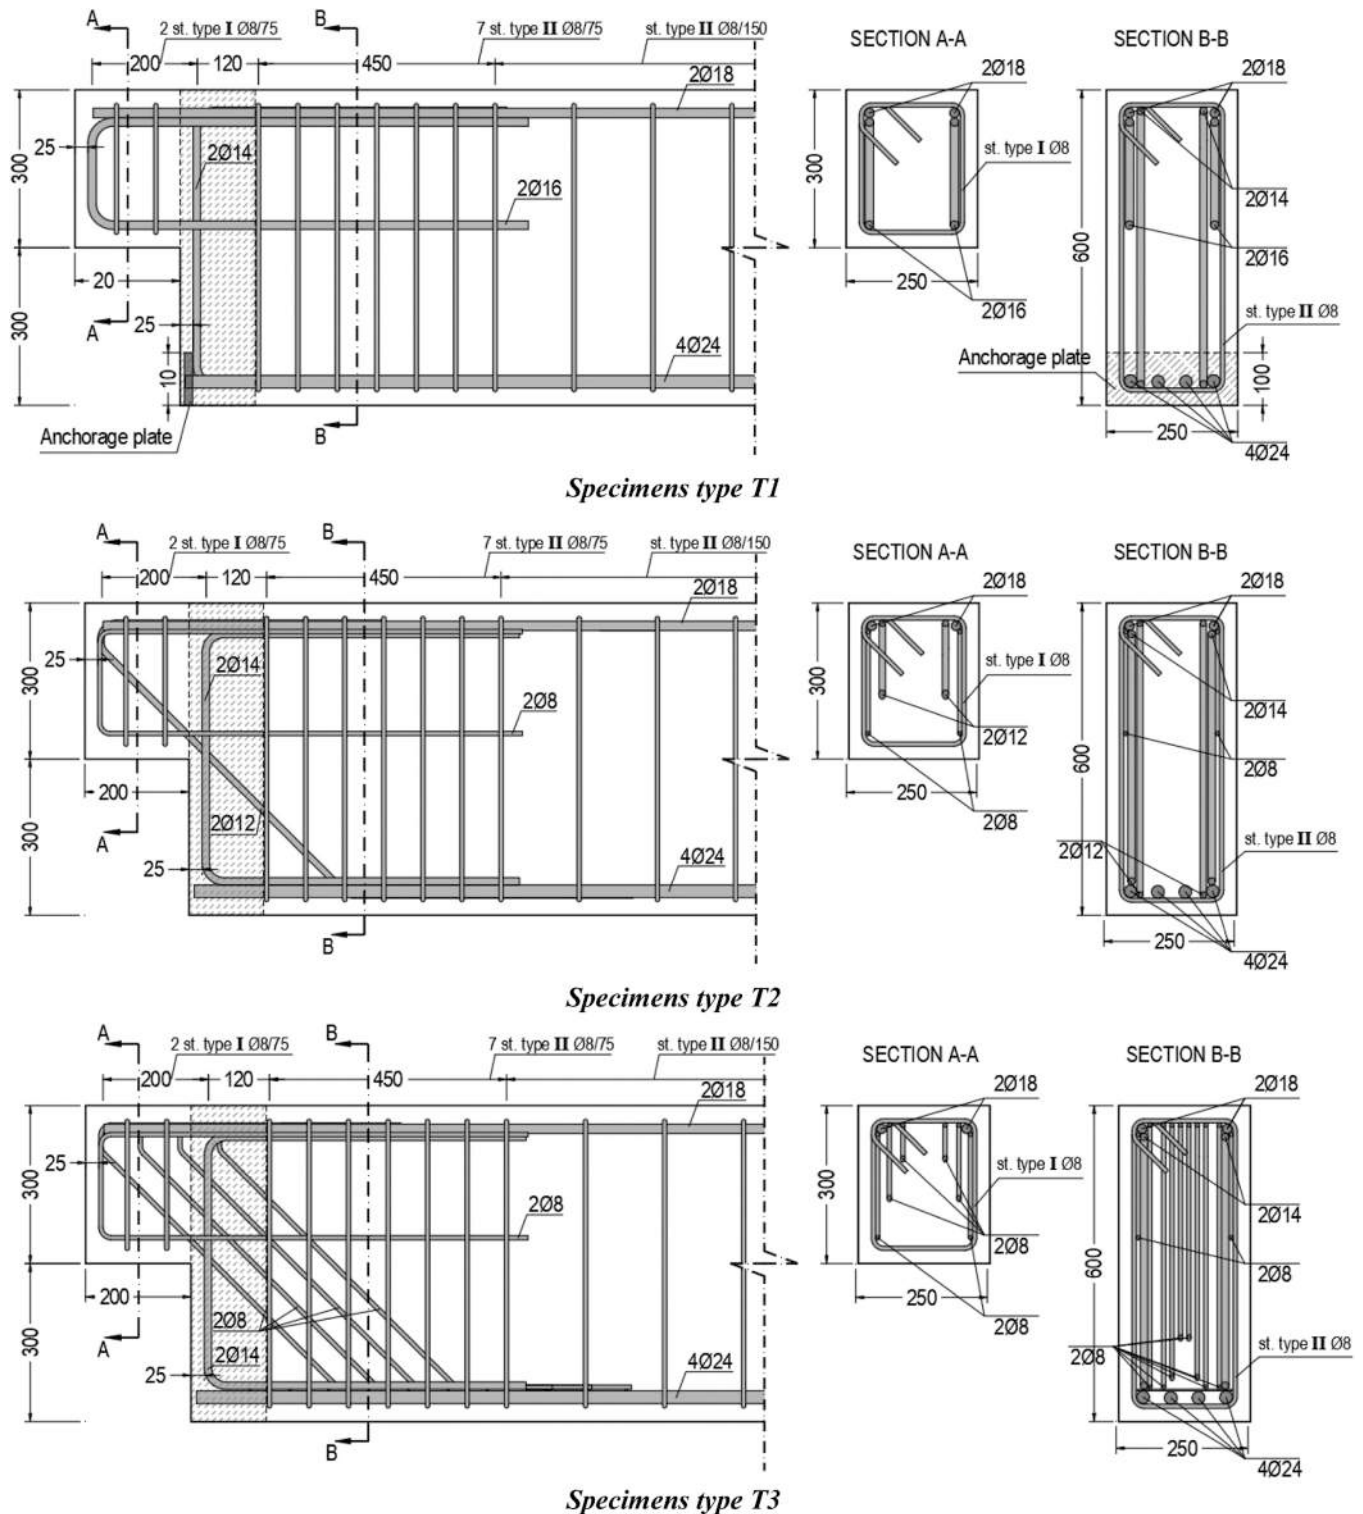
Geometry and reinforcement layout of the three dapped end types.
